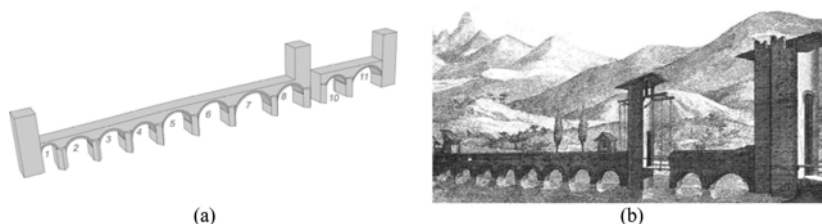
Azzone Visconti bridge: a) 2nd phase model, end of 18th century (11-span bridge with towers and drawbridge, adapted from di Prisco et al. 2019); b) view of the bridge, 1760-1771, etching of G.C. Bianchi (Giulini 1760).
